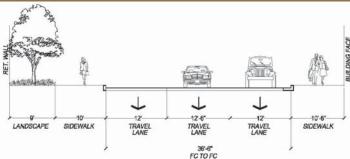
Existing one-way configuration of S. Clark/Bell Street
